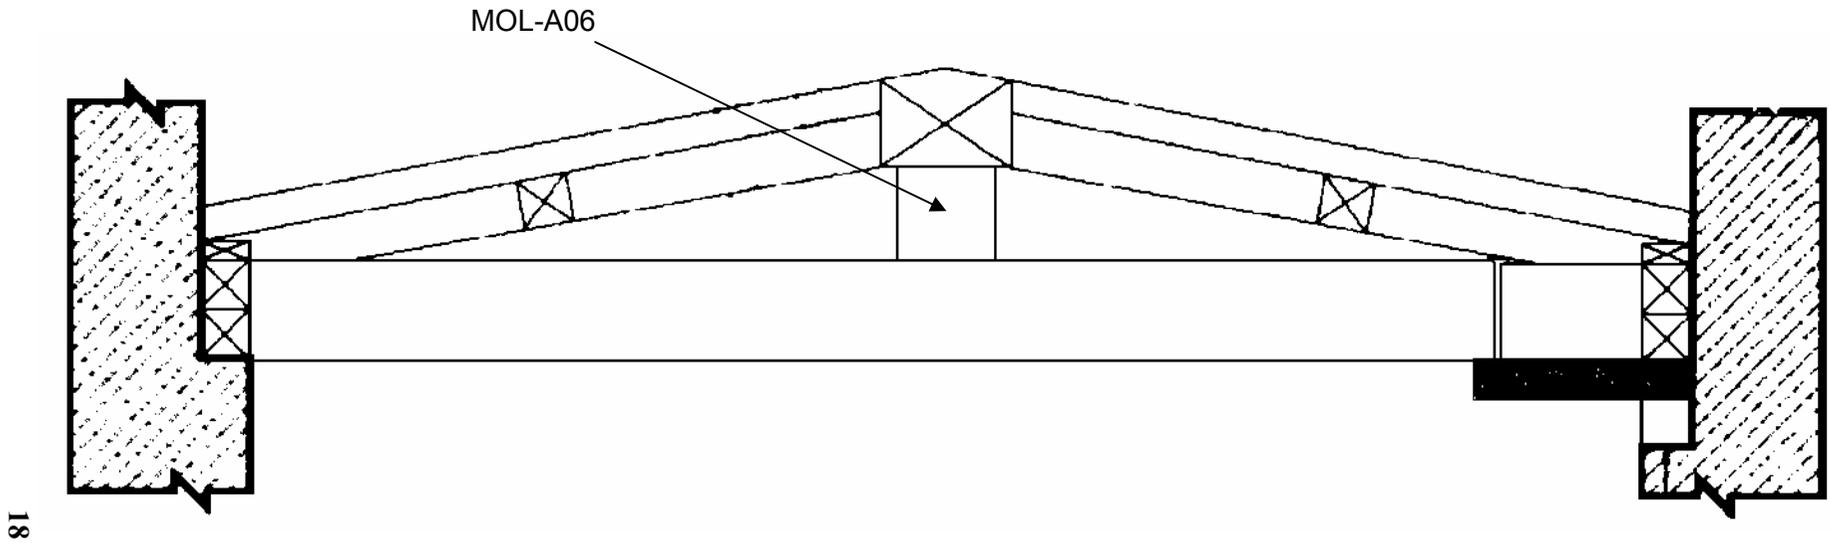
Roof truss, south truss, showing the location of samples MOL-A06 (Hockley and Dawson)
